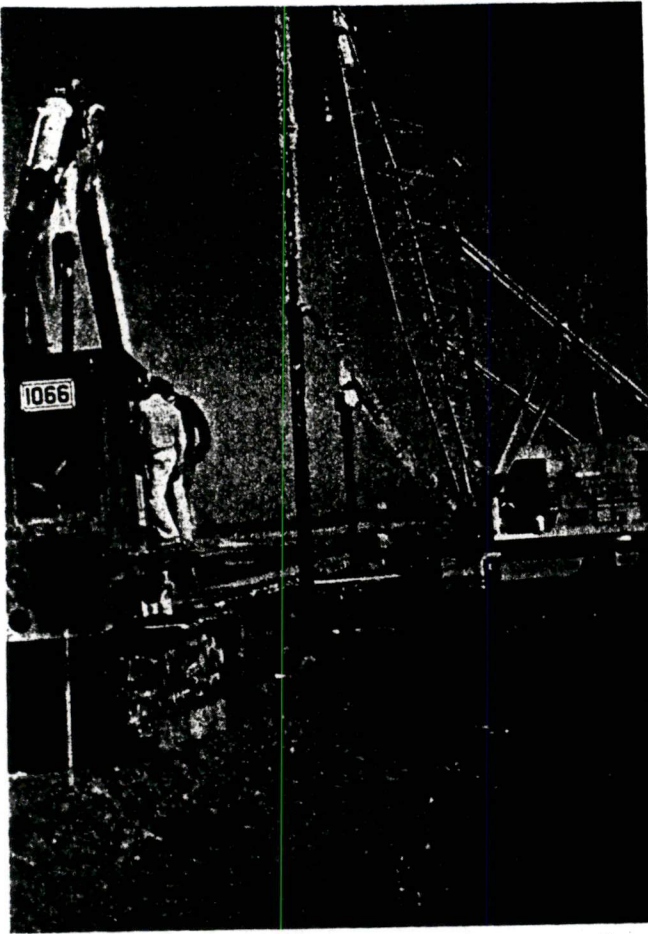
Two kelly-guided clamshells excavating deep portion of slurry trench. Initial 50-ft depth being excavated with modified backhoe in foreground. Braidwood Power Station, Ill.
